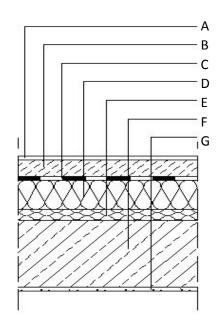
Cross-section of the tested concrete floor; (A) Floor covering (carpet), (B) cement screed, (C) Separation layer (PE-film), (D) heat insulation (EPS), (E) footstep sound insulation (mineral fibre), (F) reinforced concrete plate, (G) lime-cement plaster.
